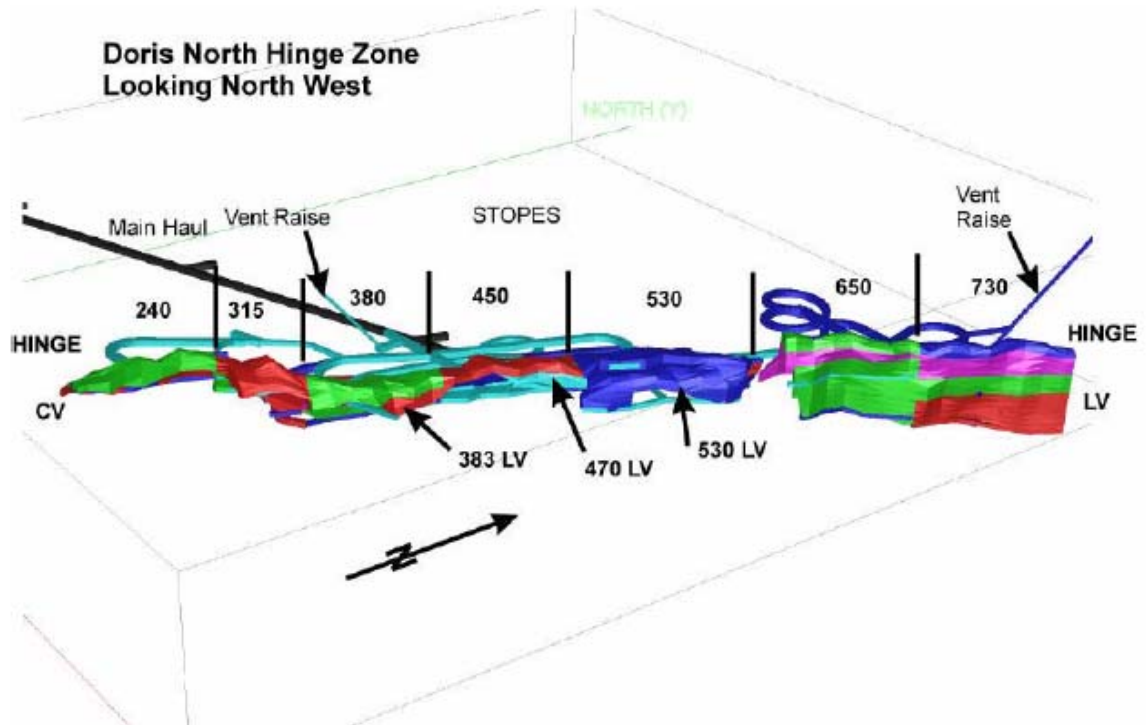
Doris North Hinge Zone Mine Design Looking North West
